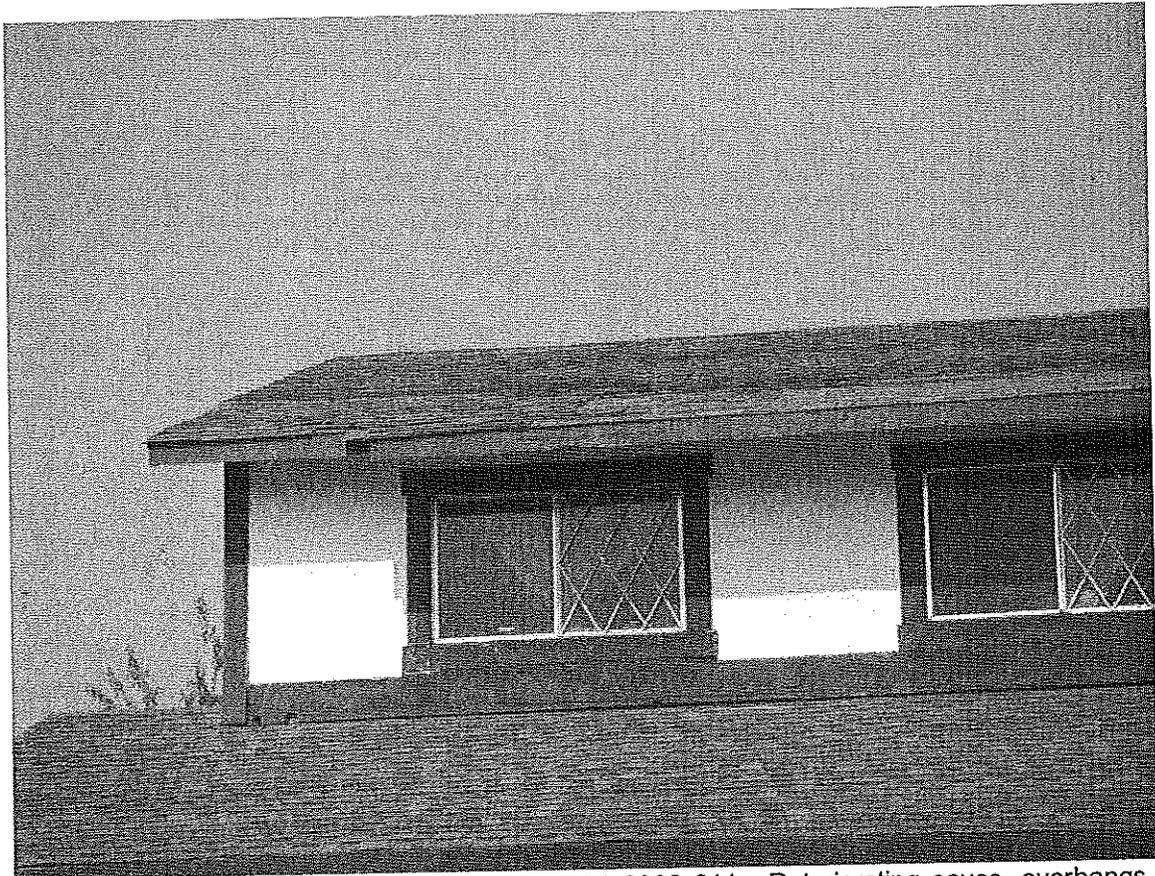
3800 Block of Fig Street, APN 251 0082 011: Deteriorating eaves, overhangs, and roofing materials are an issue at this property. The roof is peeling and tiles are missing, exposing the roof to weather induced damage.
